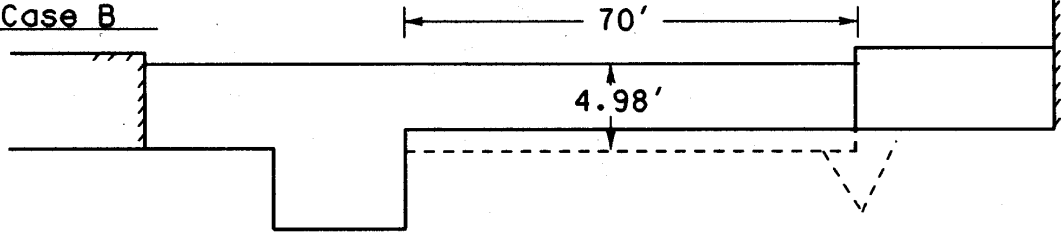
Cross Sections of Approach Flow and Under Bridge
